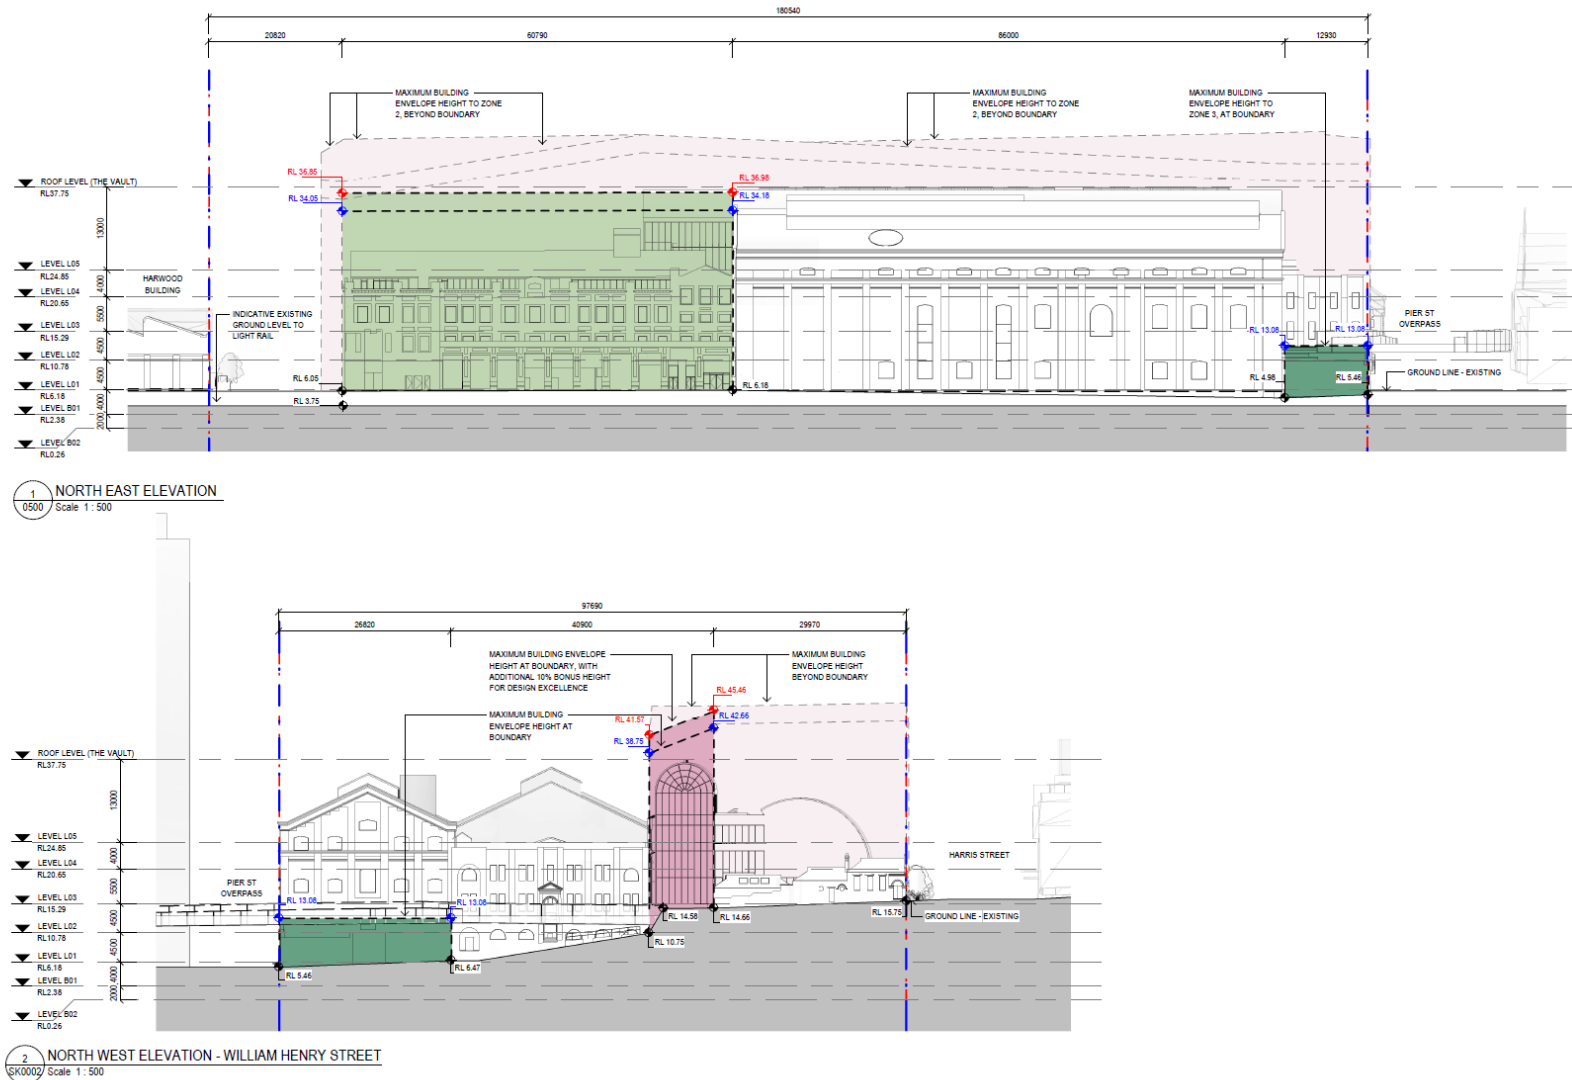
Ultimo Powerhouse- Building Envelope NE & NW Elevation (Source: John Wardle Architects, 22 Feb 2022)
